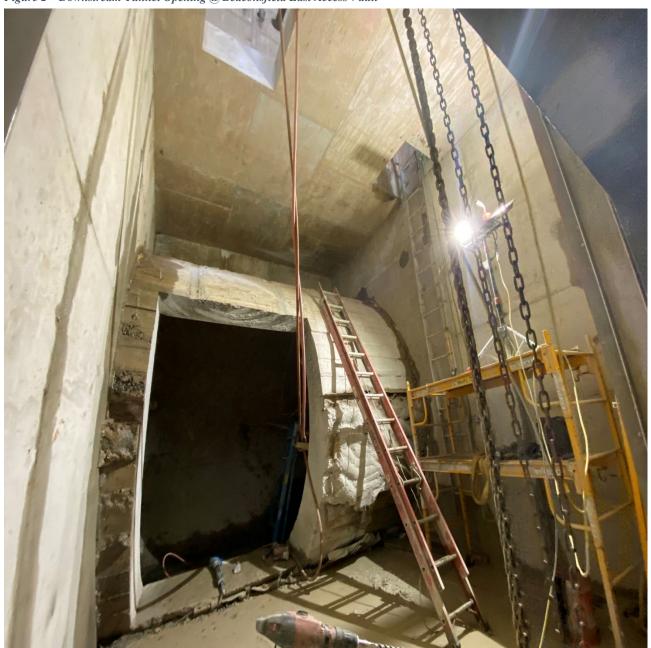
Upstream Tunnel Opening @ Beaconsfield West Access Vault
